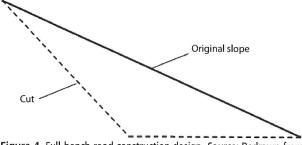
Full-bench road construction design. *Source:* Redrawn from Kramer 2001.
